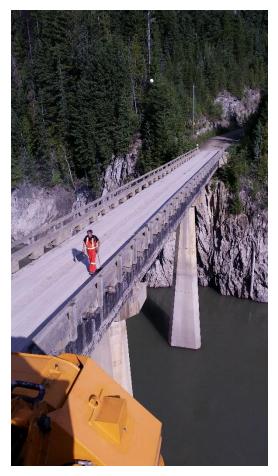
Each 27m (90 ft.) span consists of two glulam I-Beams which support transverse bearers. The deck and wear surface are made up of longitudinal planks.
